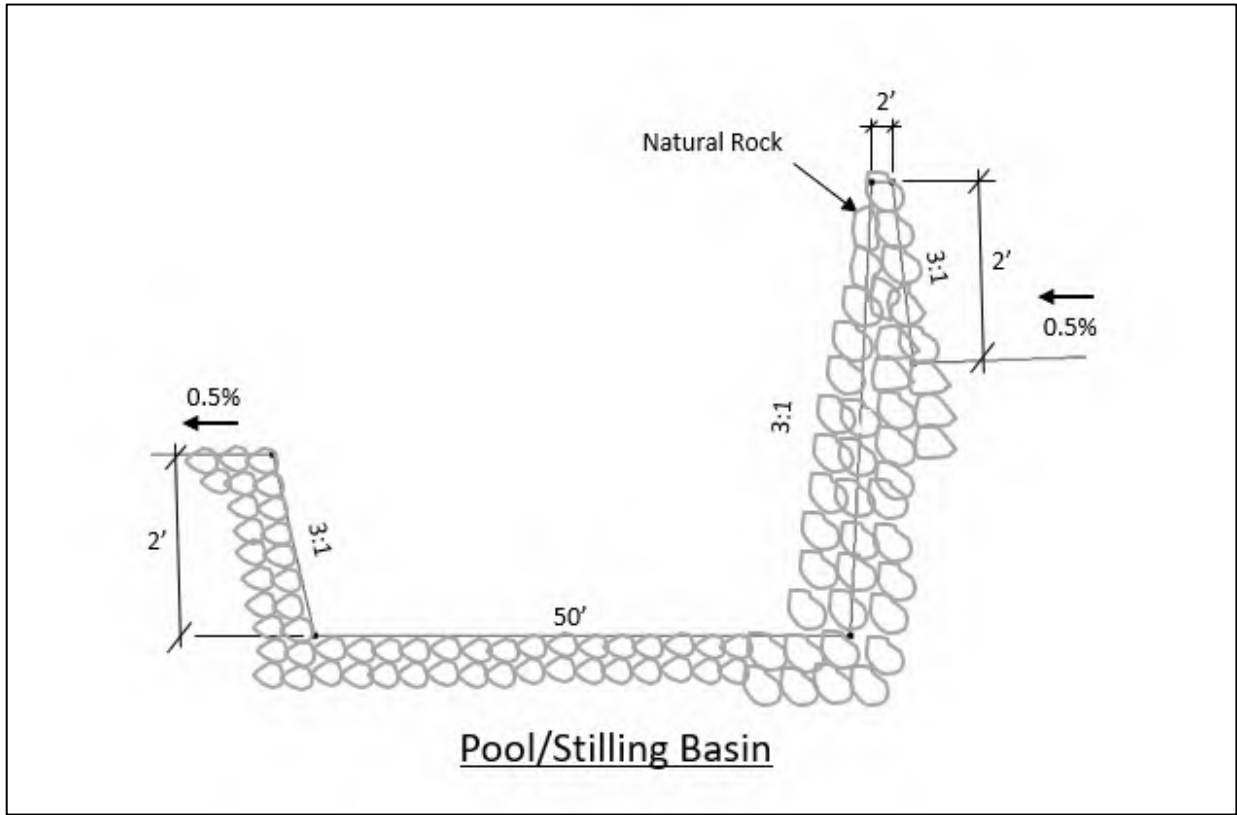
| Typical Rock Stabilization Structure Profile View, Looking West
